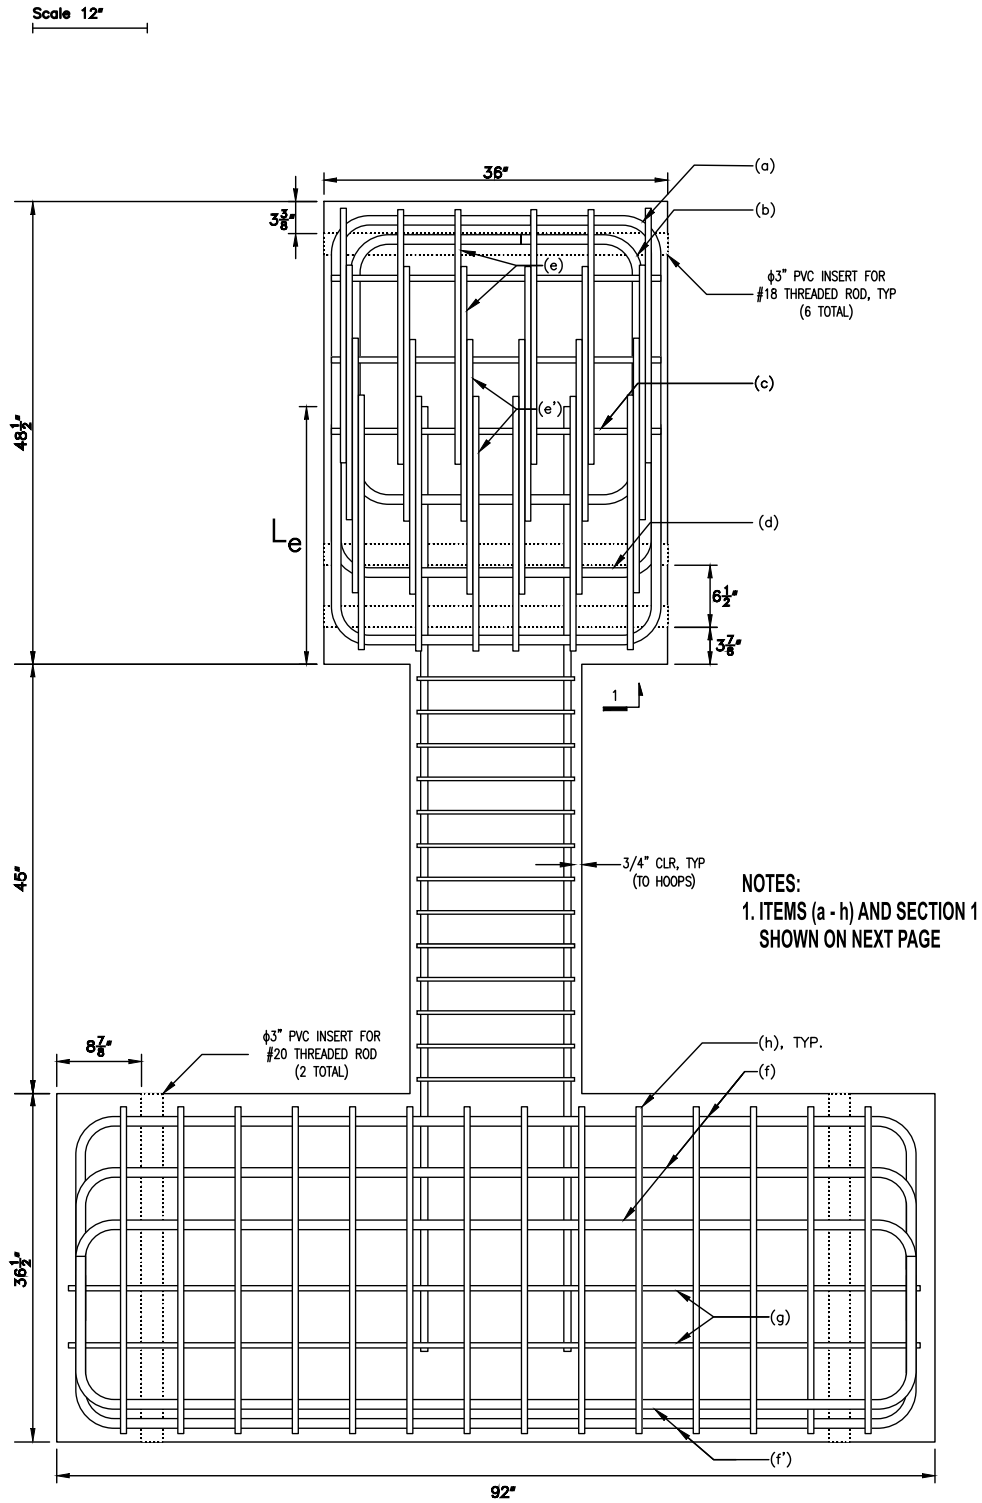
Elevation view of P80-2.5 (1 in. = 25.4 mm)
